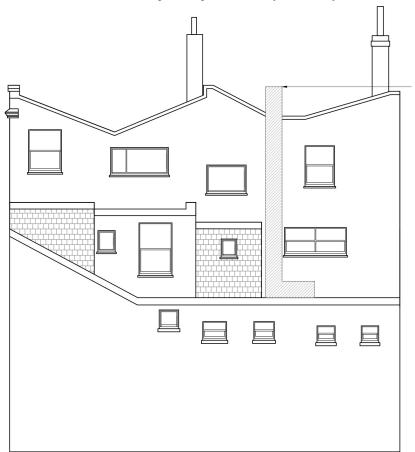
Rear elevation drawing showing termination of duct at roof level
